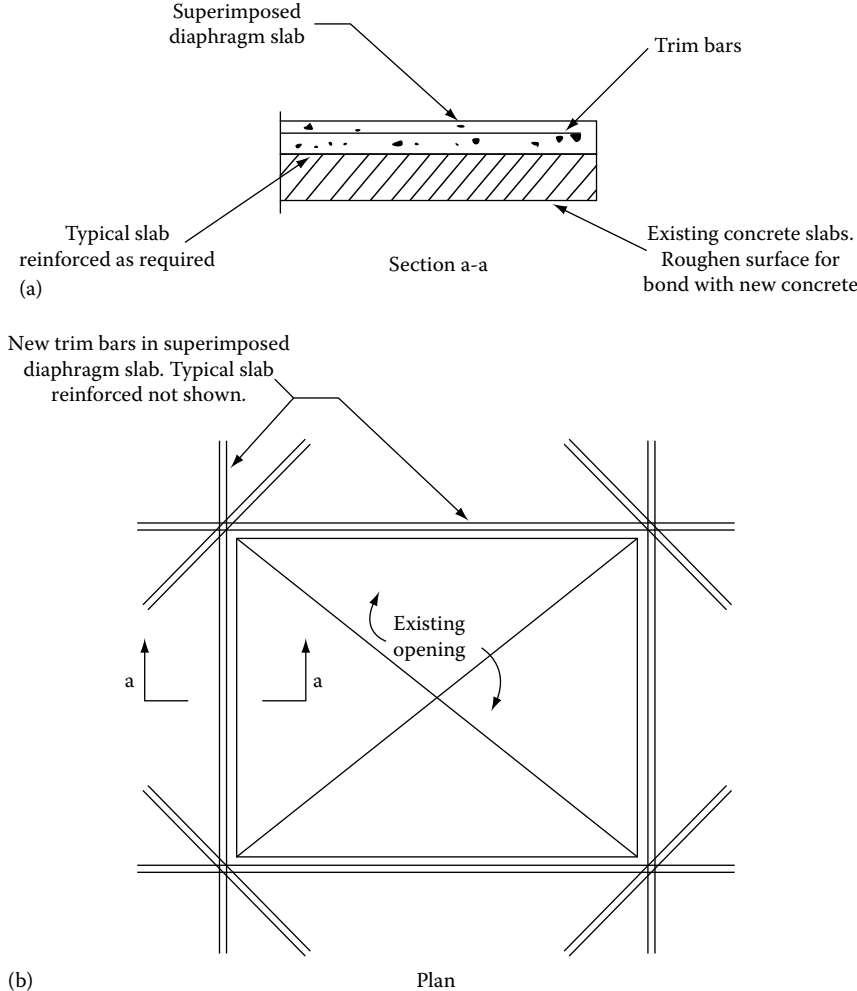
Strengthening of openings in a superimposed diaphragm; (a) section, (b) plan.
